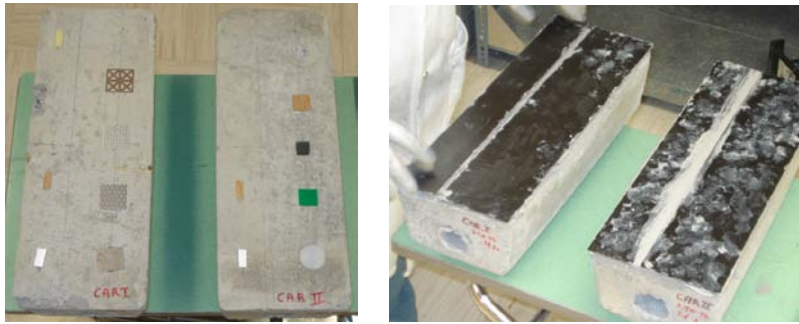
Artificial defects on the concrete block before gluing the laminates (left picture); and the two samples with CFRP laminate plates glued on cement concrete blocks (right picture).
